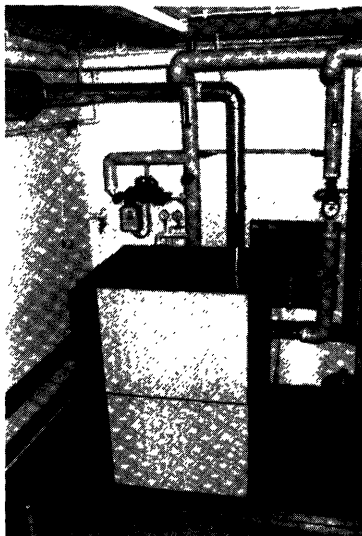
20 kW diesel engine driven compressor heat pump
